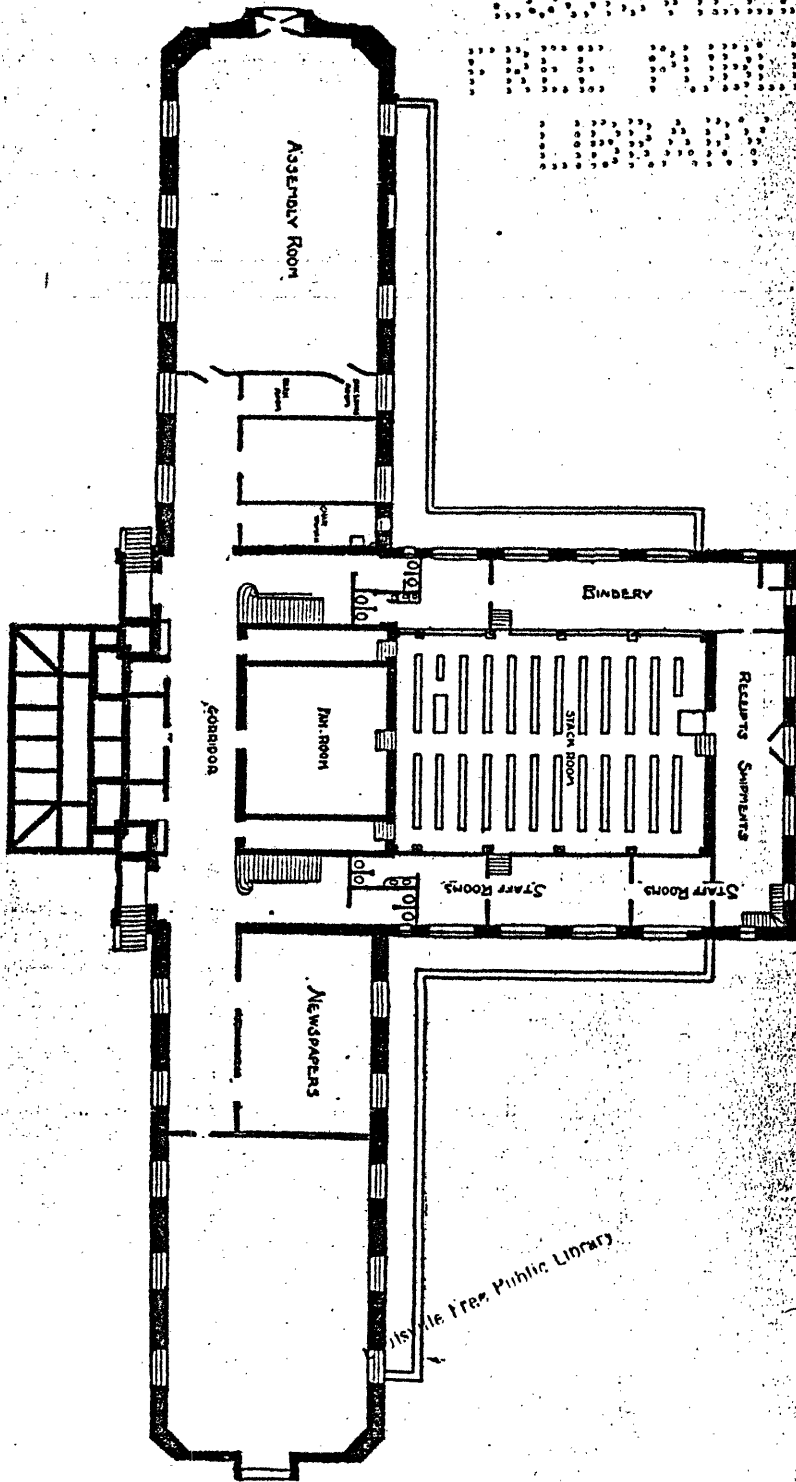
<sup>*of 9*</sup> Plan of second floor.
